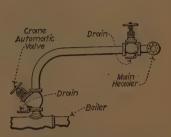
Boiler steam-outlet piping with rigid header connection.
